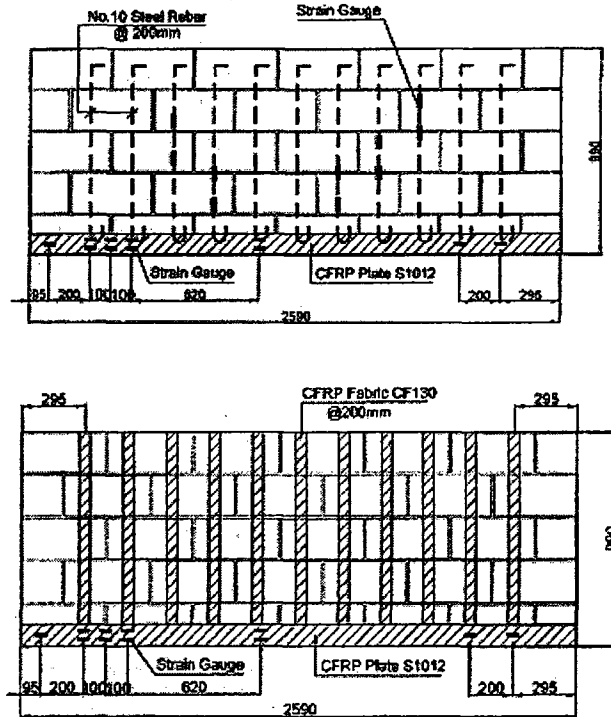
Layout of longitudinal and transverse CFRP strengthening applied on reinforced concrete masonry deep beams (Hao, Z., 2007)
